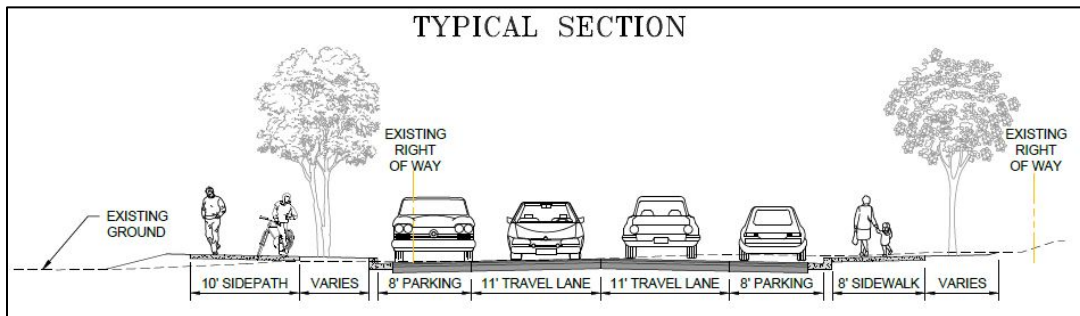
North High Street Extension Alternative 2 – Cross Section for eastern section
